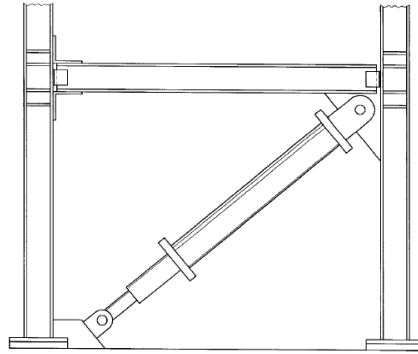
The construction detailing of a typical diagonal bracing system with a FVD (Constantinou 2002)
